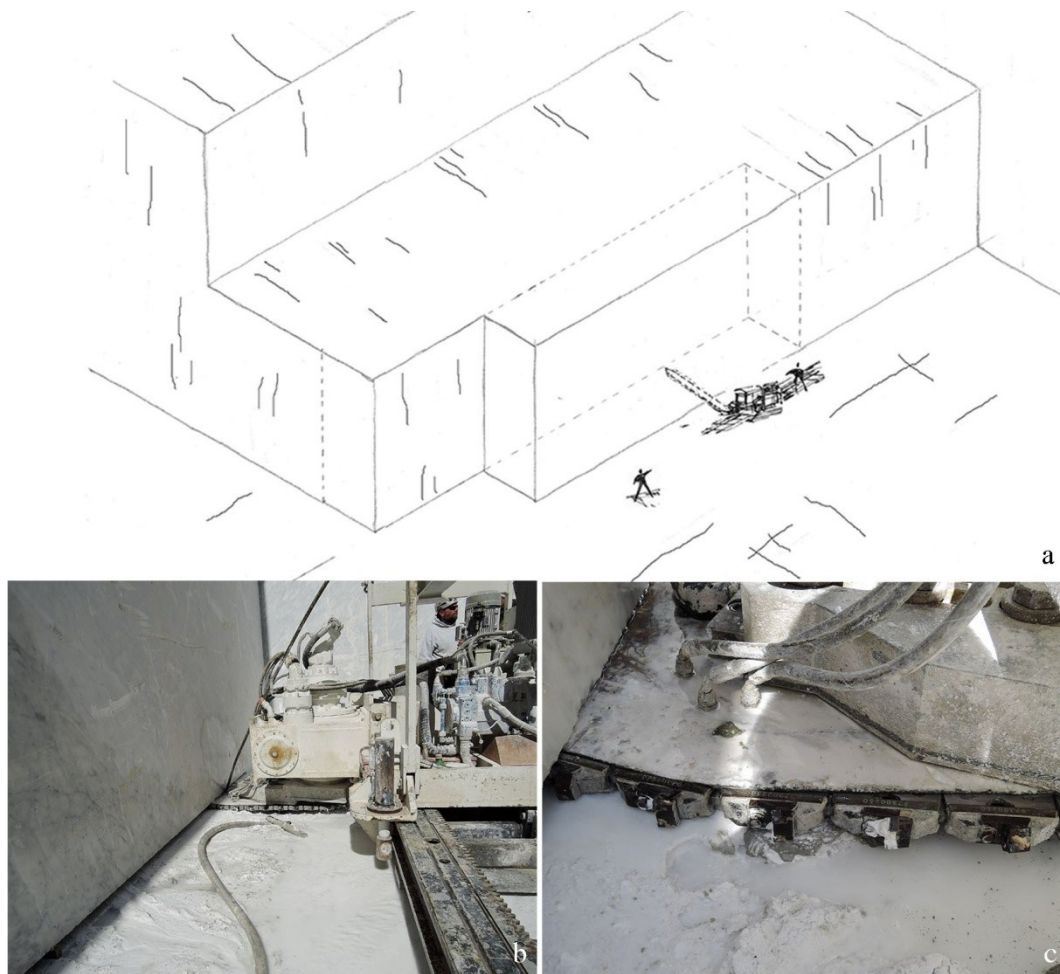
a) sketch of bench cutting with chain saw technology; b-c) chain saw cutting a Carrara marble bench
